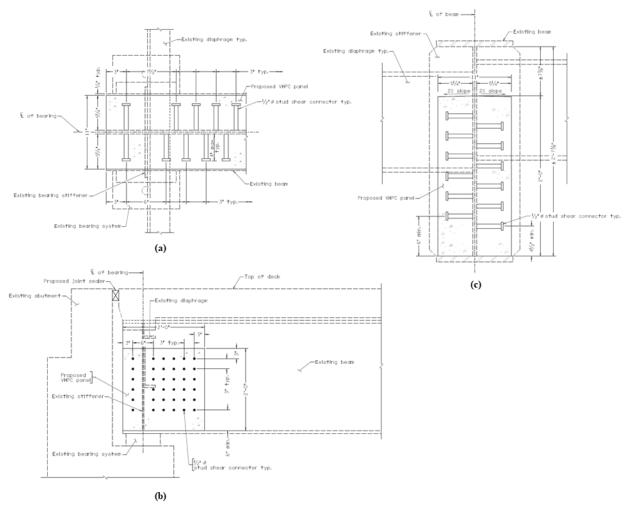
Drawings for Initial Implementation of Fiber Reinforced Concrete Beam End Repair Project in VDOT's Northern Virginia District: (a) Plan View; (b) Elevation View; (c) Section View
